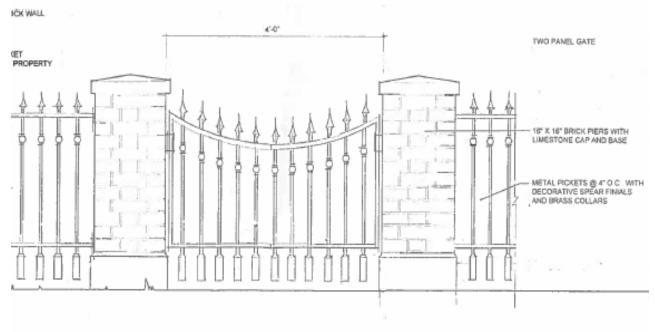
Proposed brick and metal fence for 700 S. Pitt Street.
